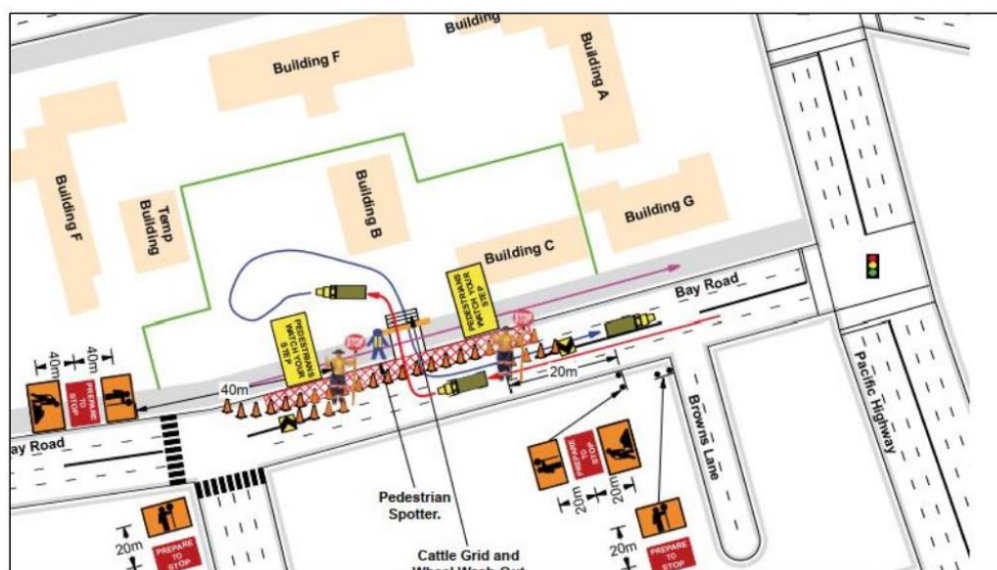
Proposed vehicle entry and exit from the site (Source: Taylor)
